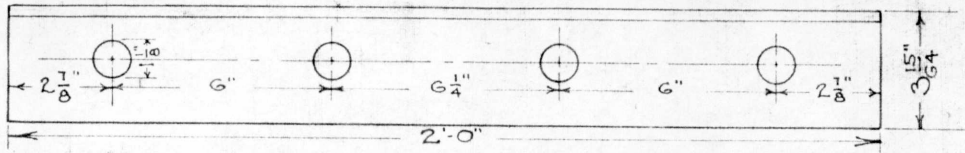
OUTSIDE WOOD FILLER SEE SECTION BELOW
